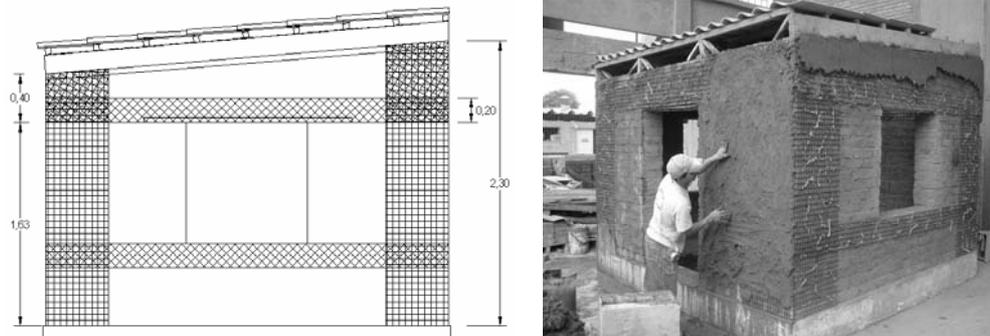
Reinforcement arrangement and construction of model M050-T11.
